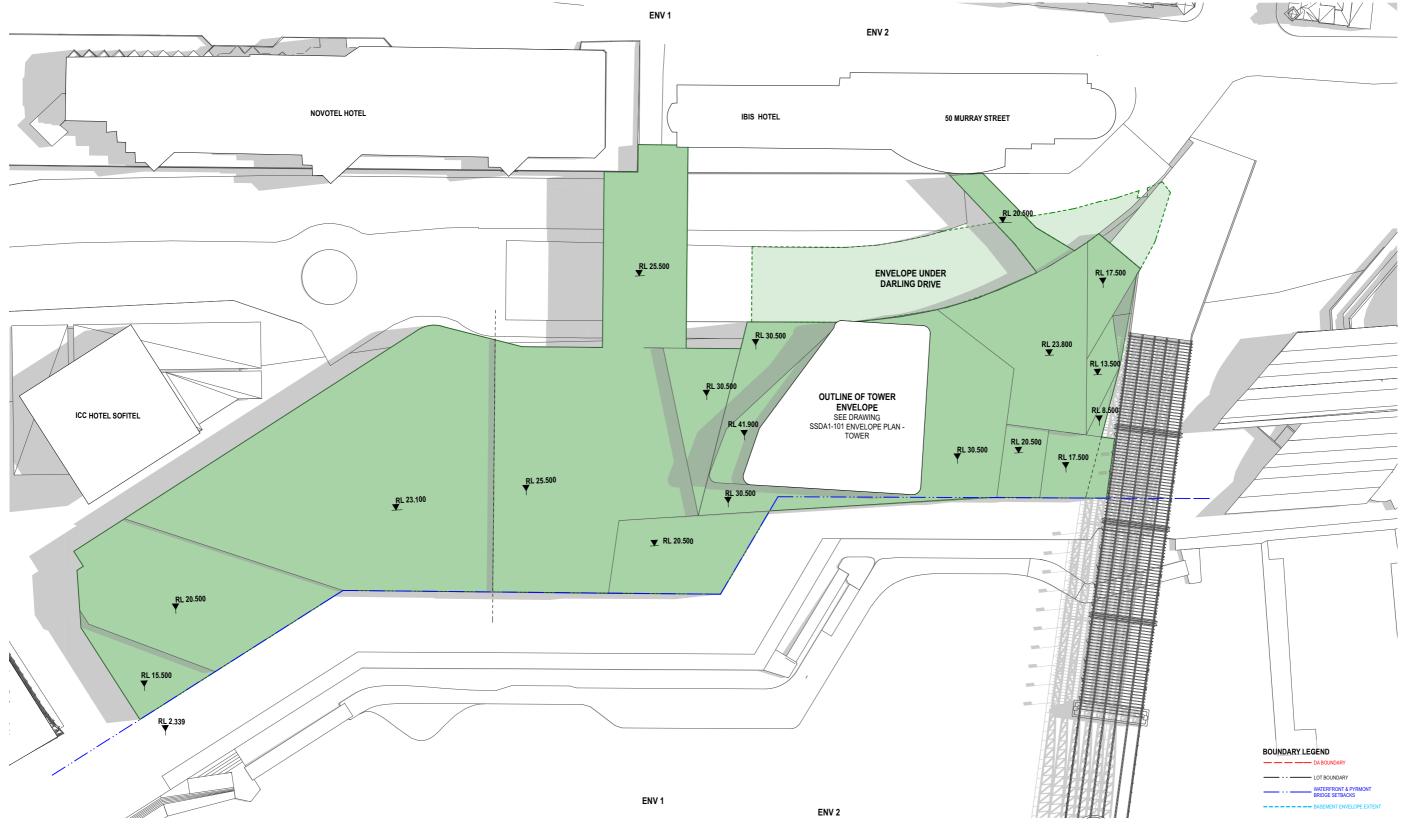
Proposed envelope - plan view (FJMT)
